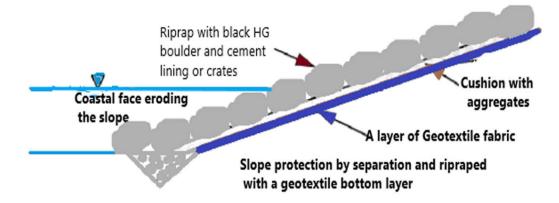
The proposed slope protection works where sea shall erode the pavement
